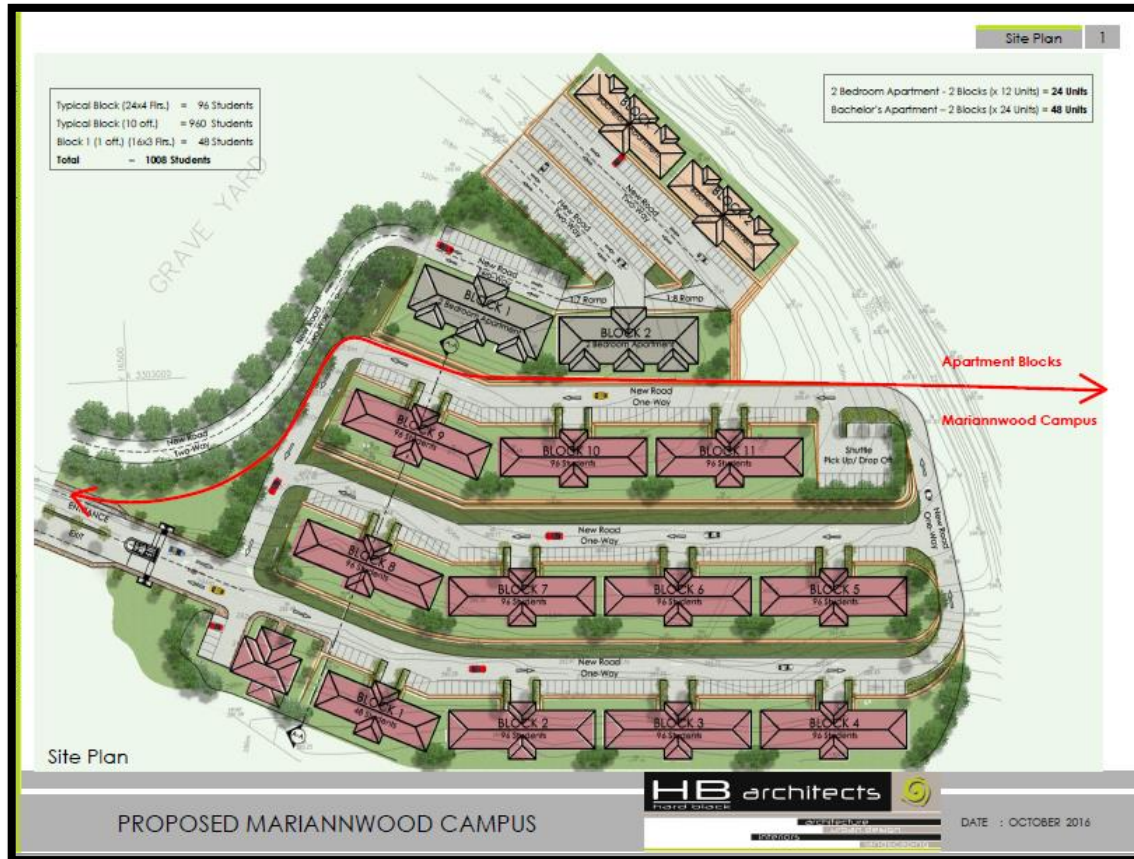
Site Plan of the proposed Mariannwood Campus (Source: HB Architects).
